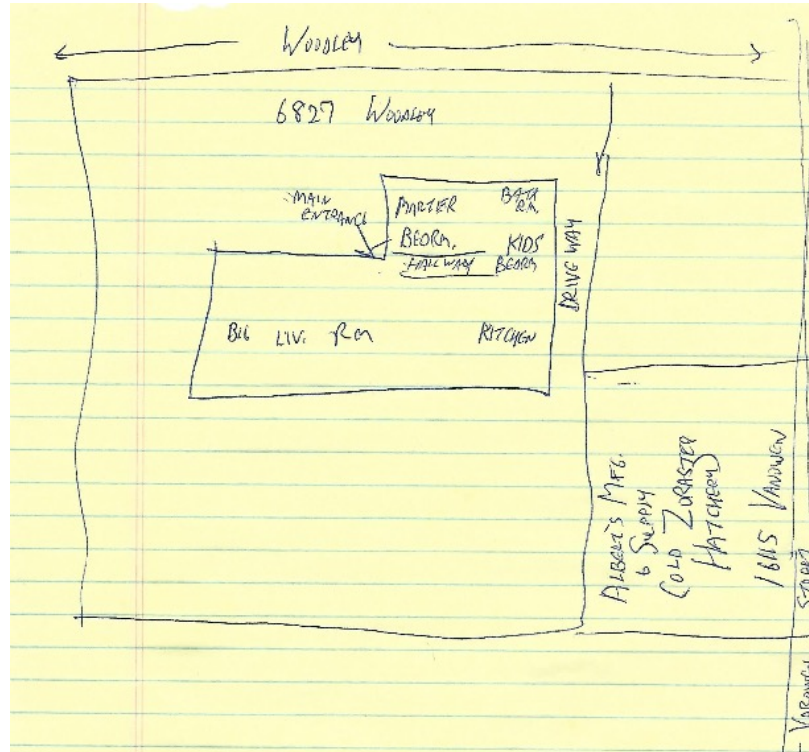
Floor plan of David Zoraster's house, also designed by George Chapman. Drawn by David Zoraster.
